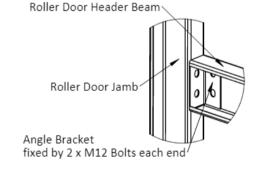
# DETAIL A TYPICAL SIDE ENTRY ROLLER DOOR JAMB TOP CONNECTION
